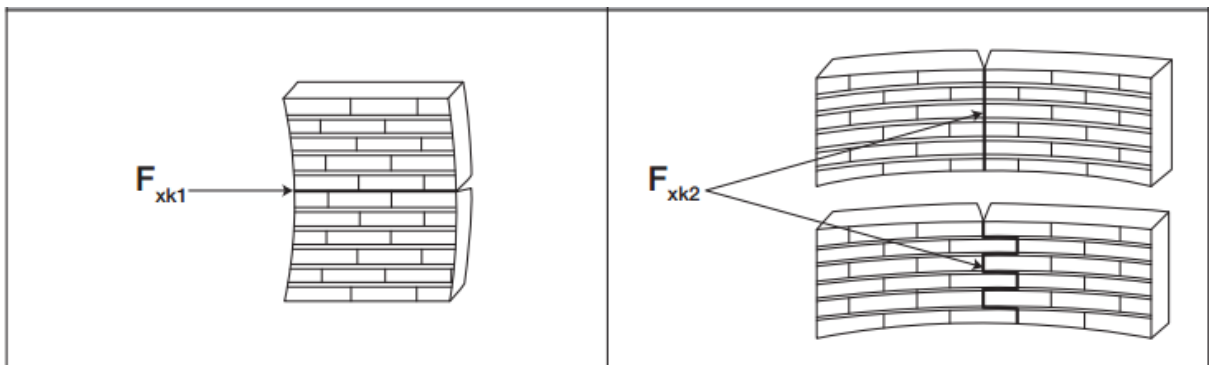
failure modes of unreinforced masonry: (left) parallel or (right) perpendicular to bed joints (after Eurocode 6)
